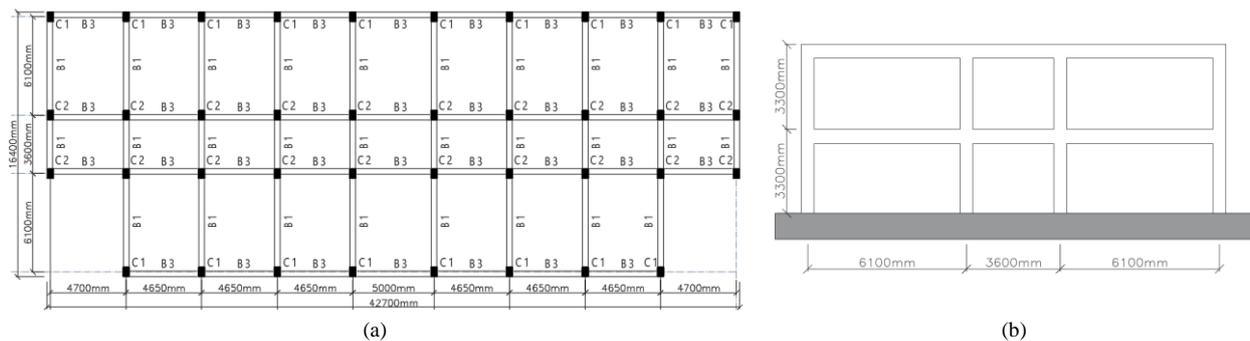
From Sharafi and Saito [15], A-type two-story RC structure (a) first-floor plan, (b) RC frame (transverse direction)
